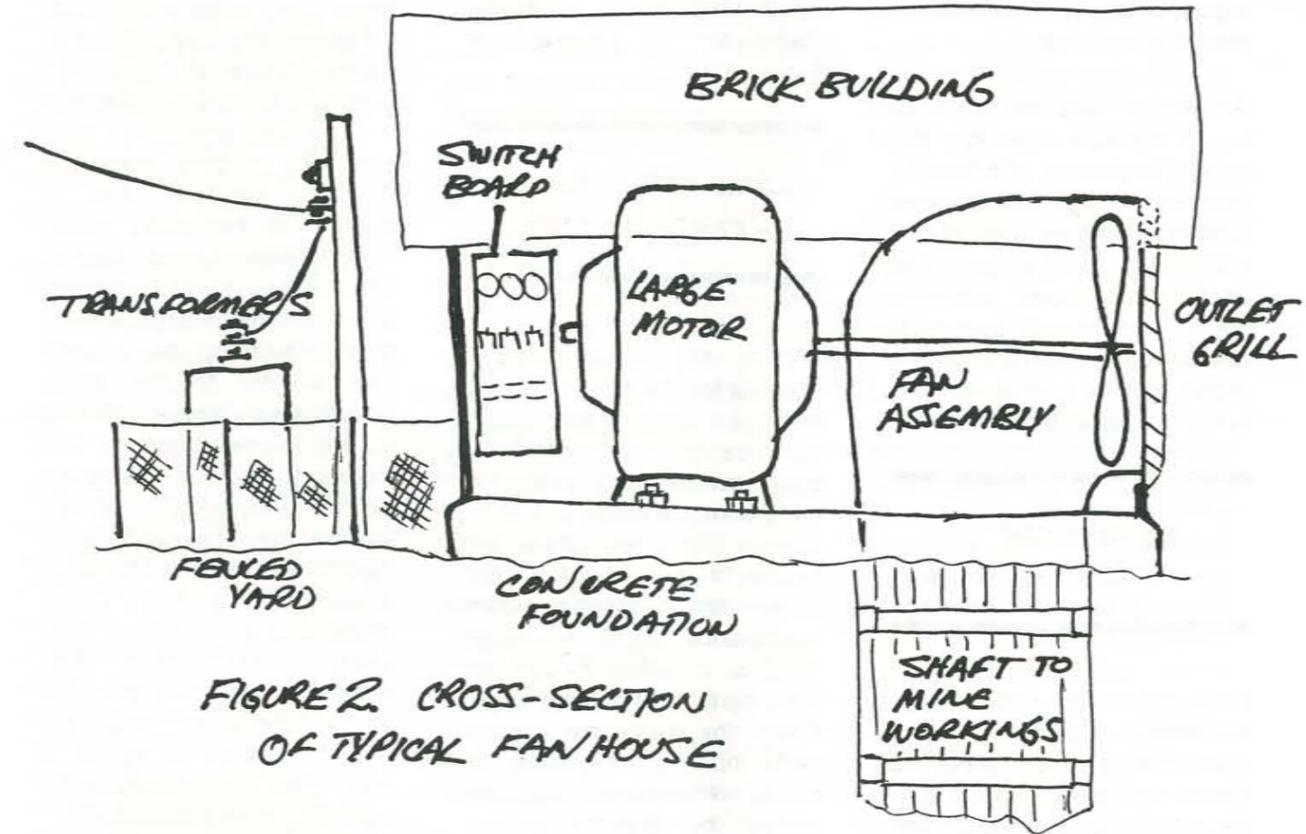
CROSS-SECTION OF TYPICAL FAN HOUSE
